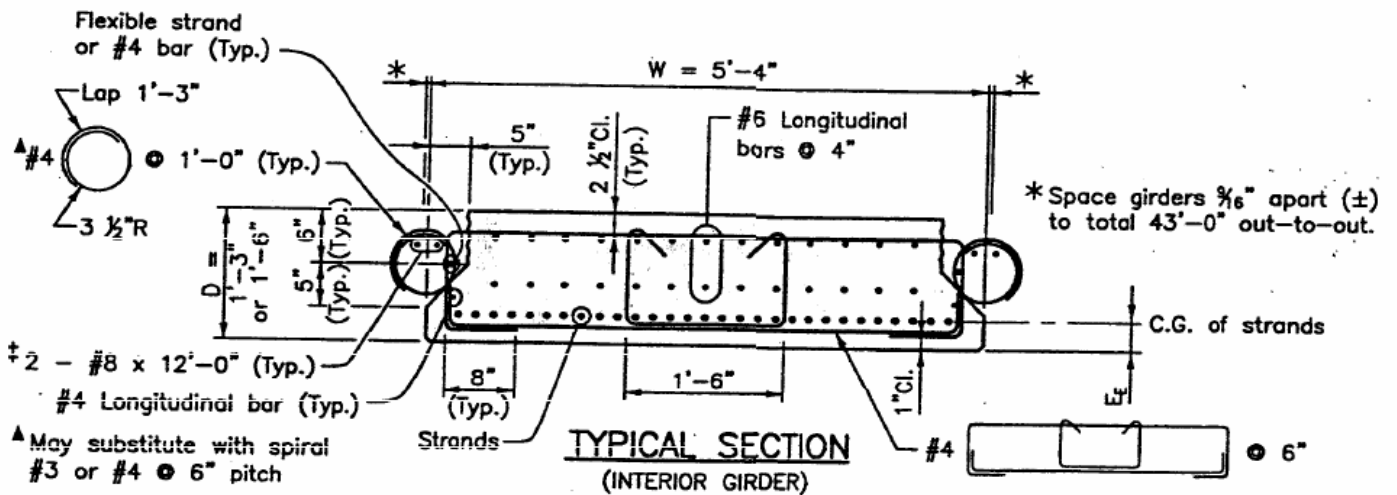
Typical cross section of the interior the precast panel
